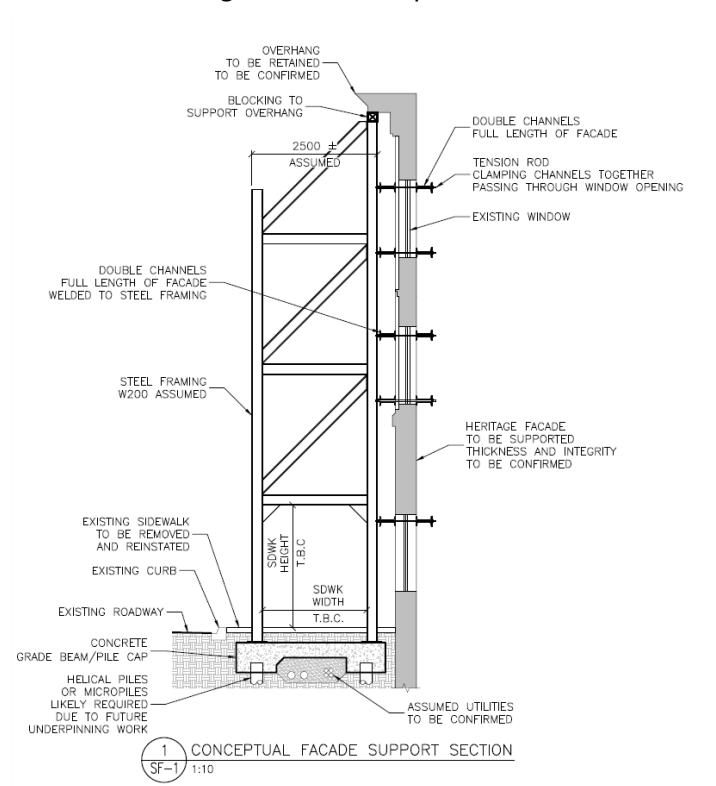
SF-1 Conceptual façade support section. Source, Art Engineering Inc. August 24.
